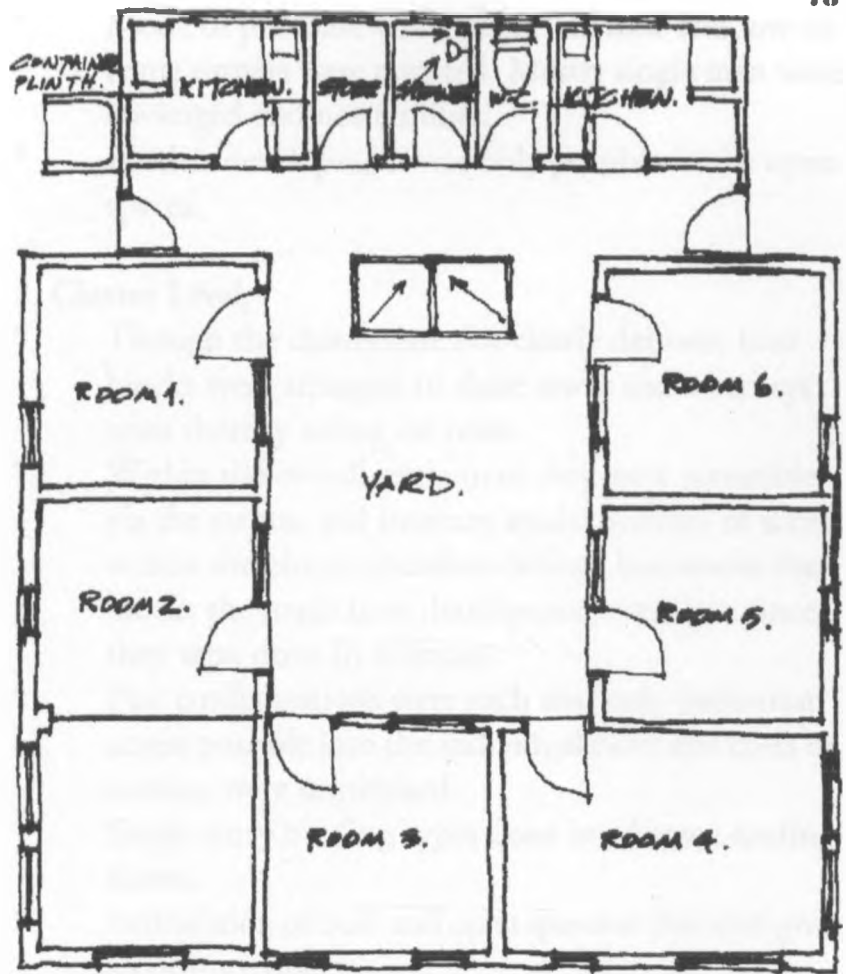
Typical Floor Plan of the Karanja Road Houses.
